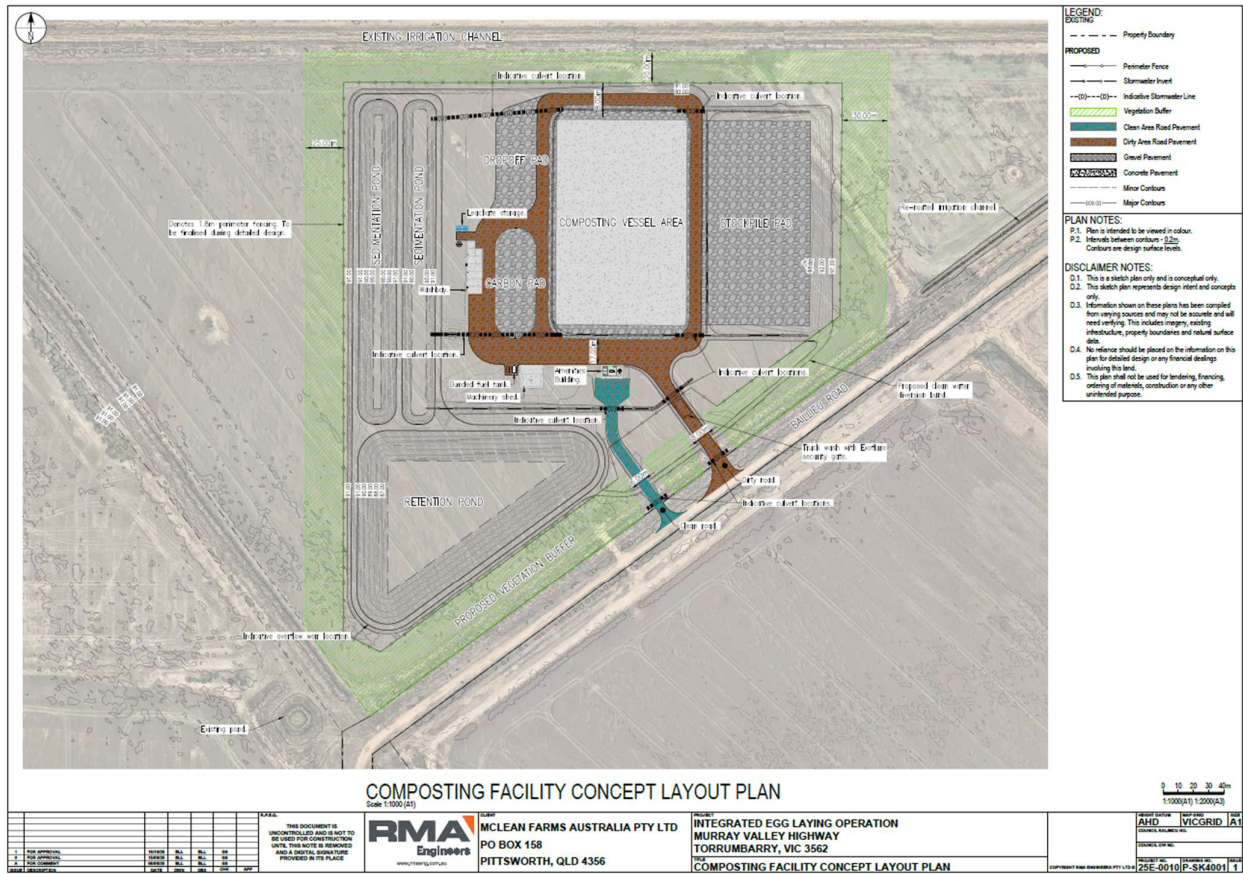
Composting Facility Site Plan (RMA Engineers, 2025)
